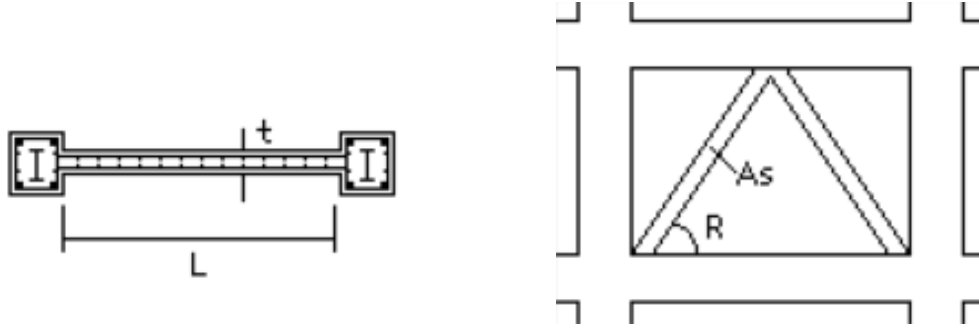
Element model for SRC wall (RC wall with steel brace)
